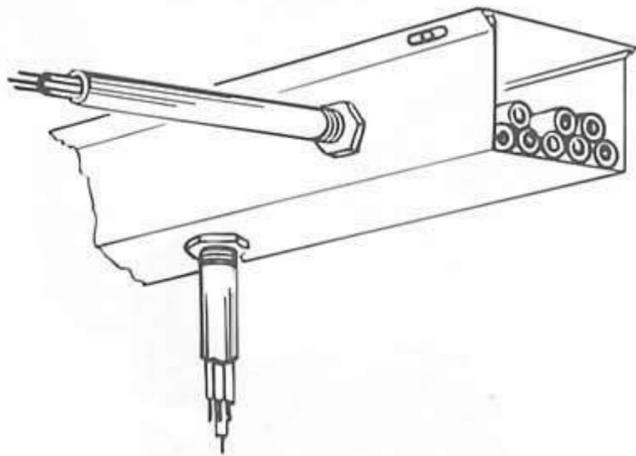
Trunking system with conduit take-offs VASS ELECTRICAL INDUSTRIES
